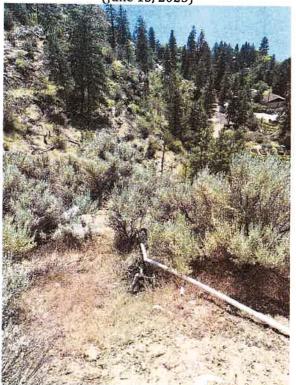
View looking south at overflow piping that was replaced after mudslide. (June 13, 2025)
